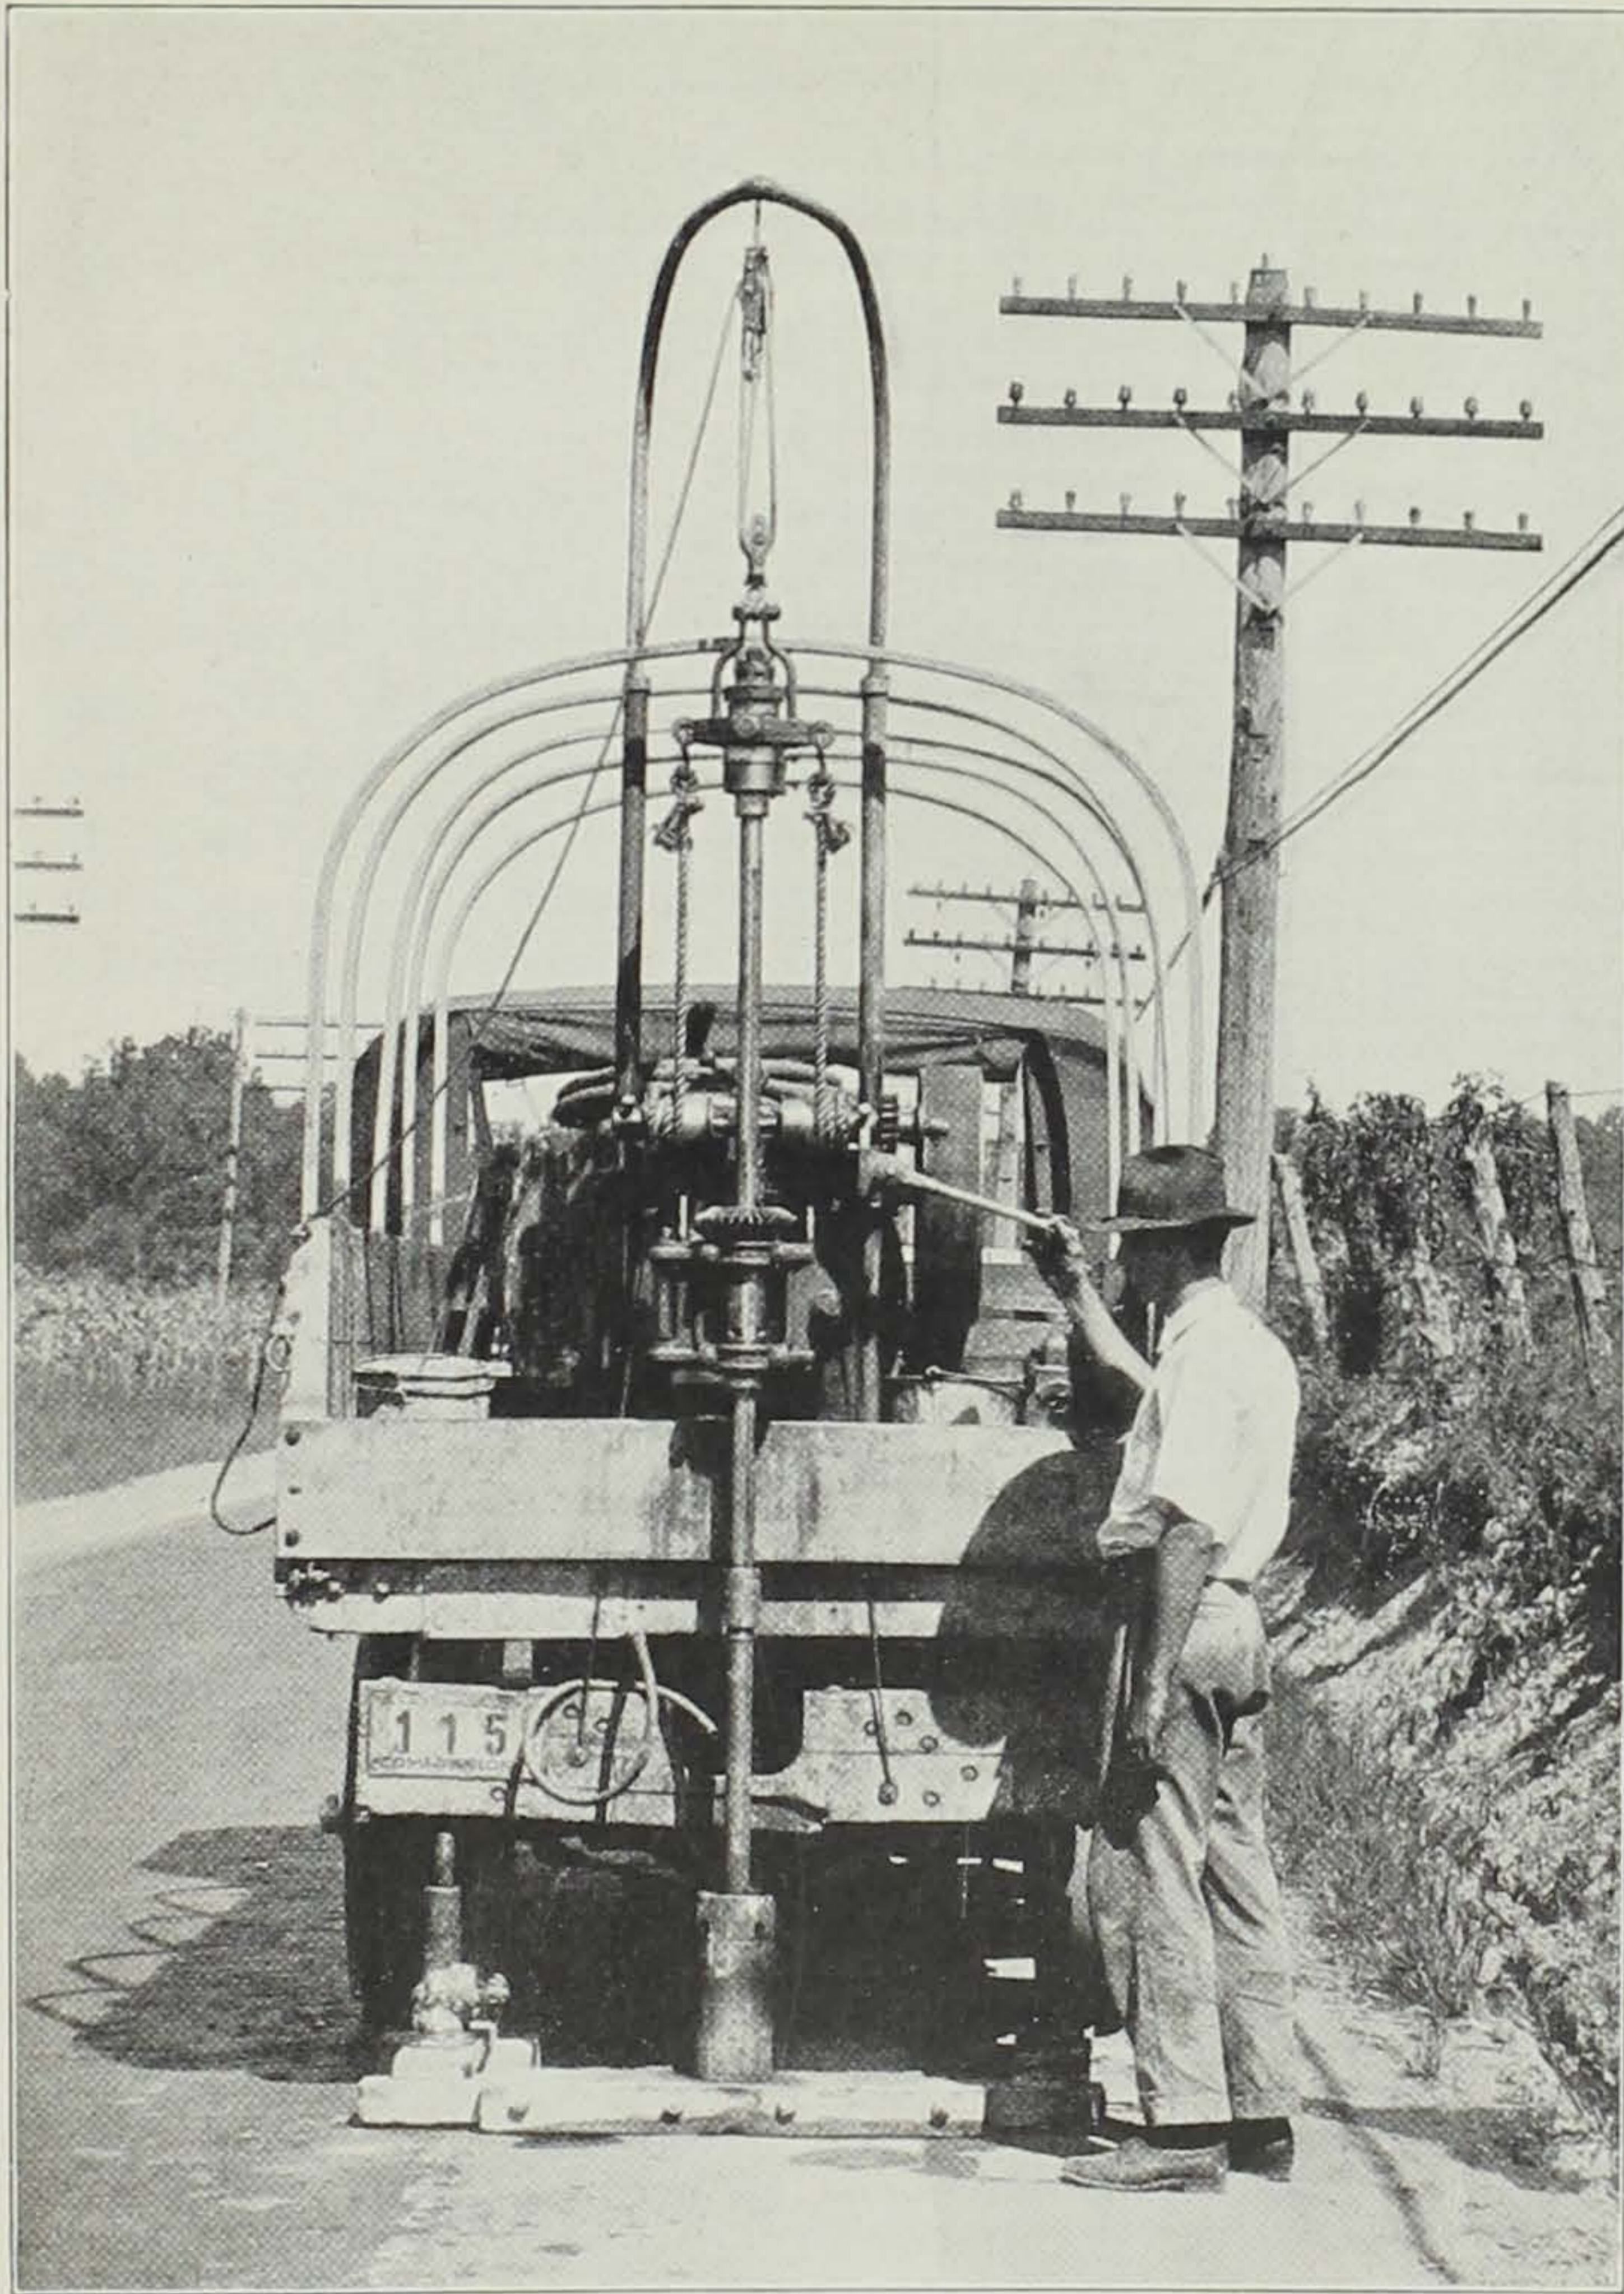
CALYX CORE DRILL ARRANGED ON MOTOR TRUCK
